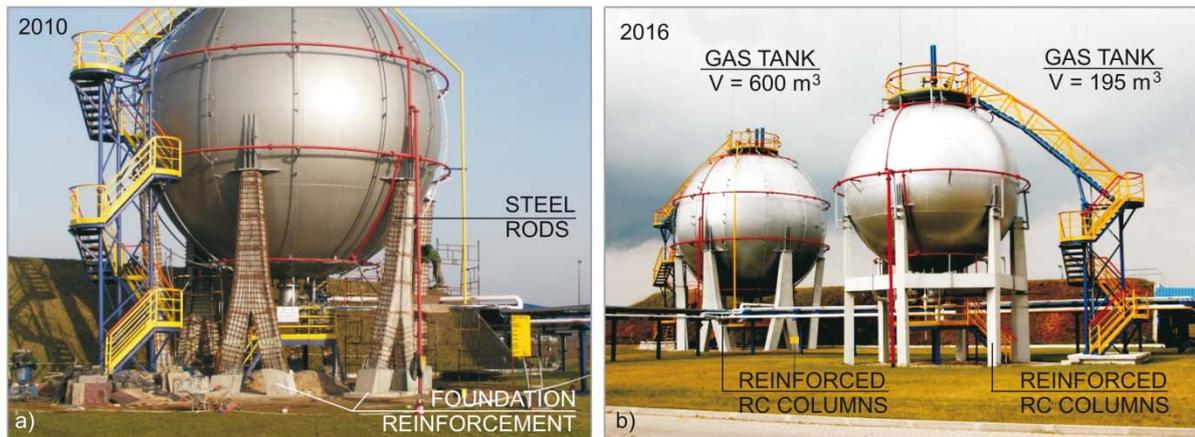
Details of the implemented tank reinforcement structure: a) view of the columns, b) view of the tanks after their structural reinforcement
